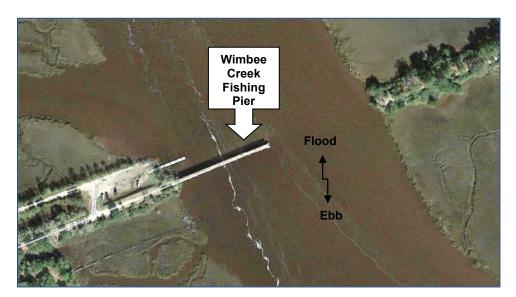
Aerial View of the Wimbee Creek Fishing Pier
